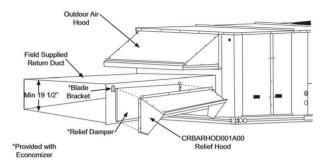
Installing CRBARHOD001A00 Over Relief Damper
